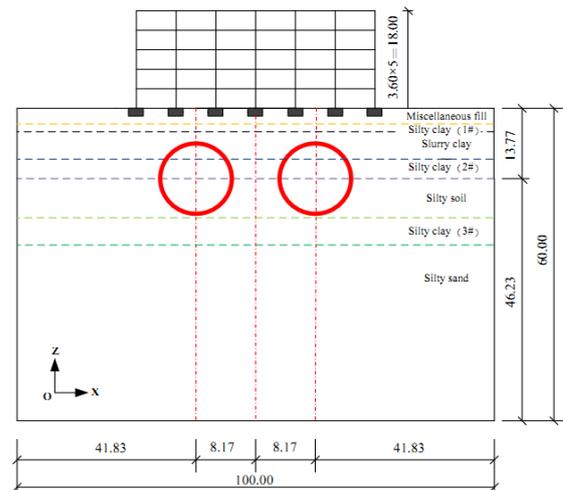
Cross-section drawing of FFTB adjacent to double-line tunnel (unit: m).
